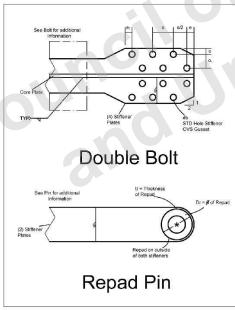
Double Bolt and Pin Connection Details for BRB-1
